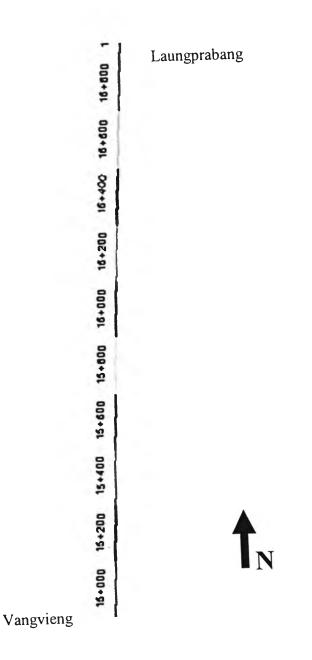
Section 3 Road Condition from Vangvieng to Laungprabang
